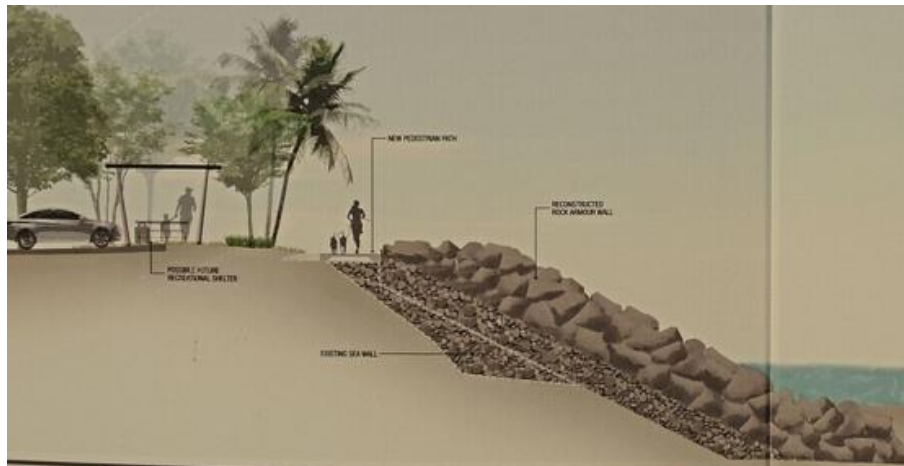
New engineered seawall at Machans Beach (Queensland Coast 2014)
